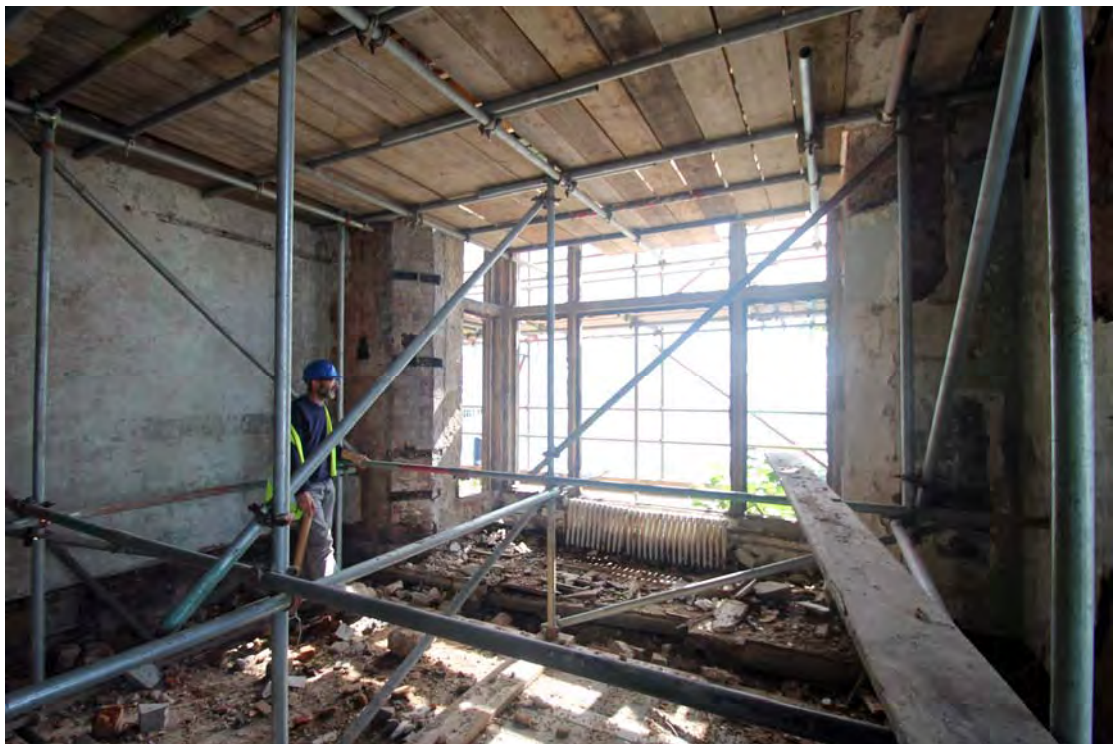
Mansion House, ground floor, Parlour? (Room G4), viewed from north.
